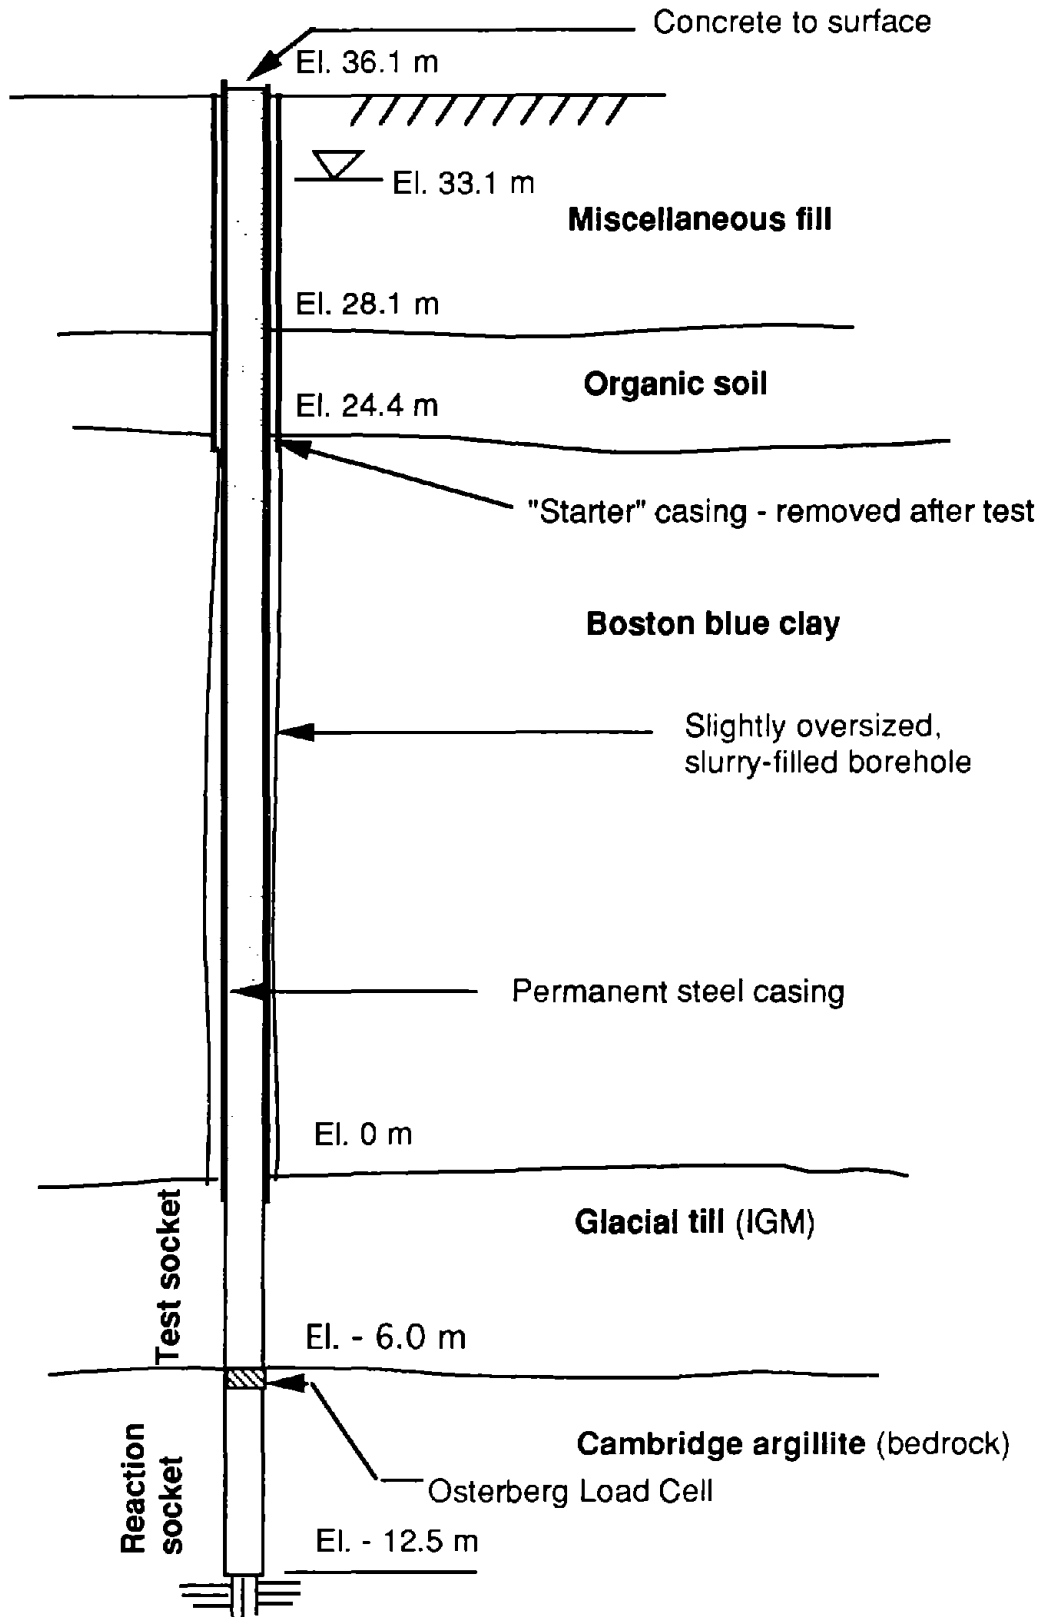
Elevation view of Boston test shaft and geomaterial profile.
